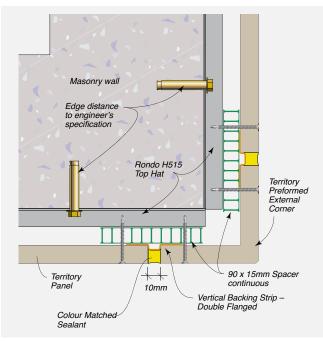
External Corner Detail – With Coloured External Corner Trim – Plan View
